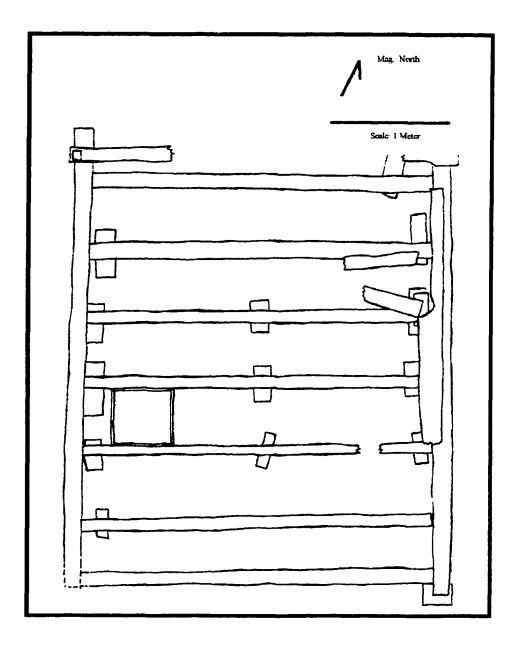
Coldfoot Feature 4, excavated foundation's remaining structural elements.
